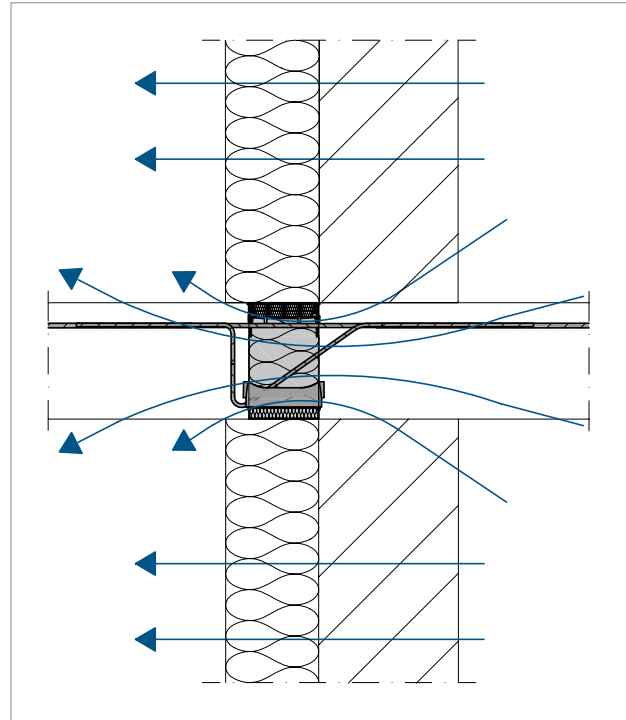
Minimal thermal loss for balconies or passageway walks with a load bearing thermal break element
